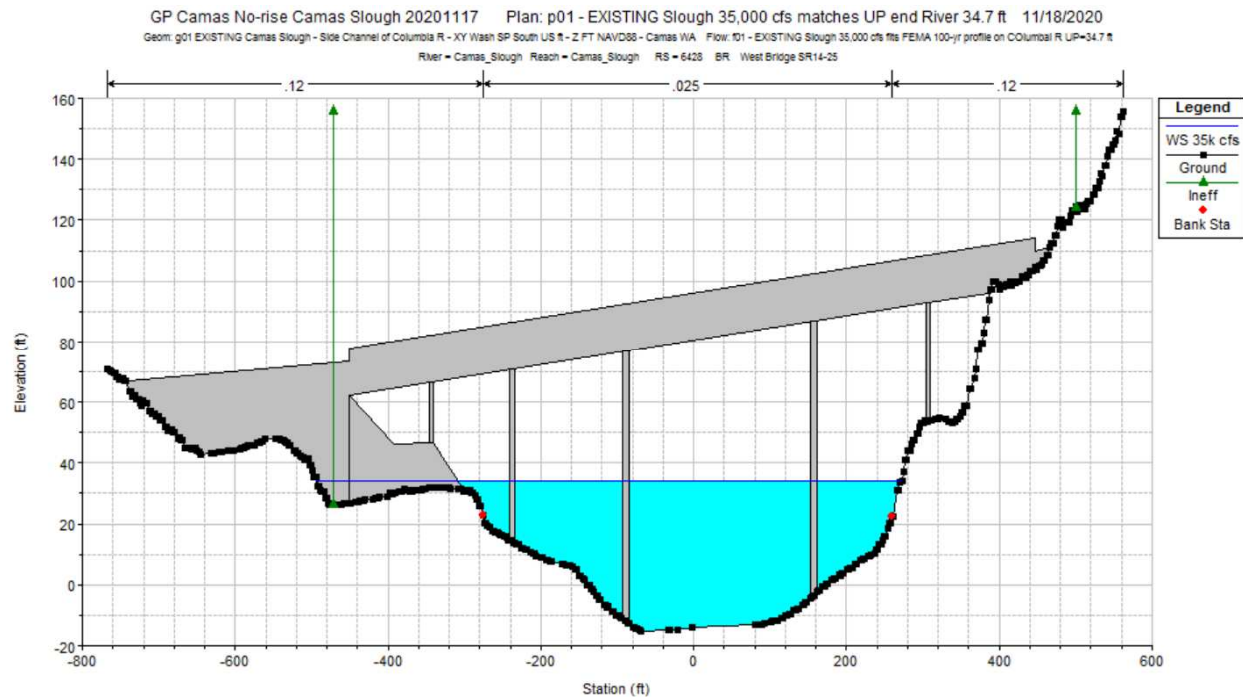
Model Cross-Section of West Bridge: SR 14/25 (ID 6428)
